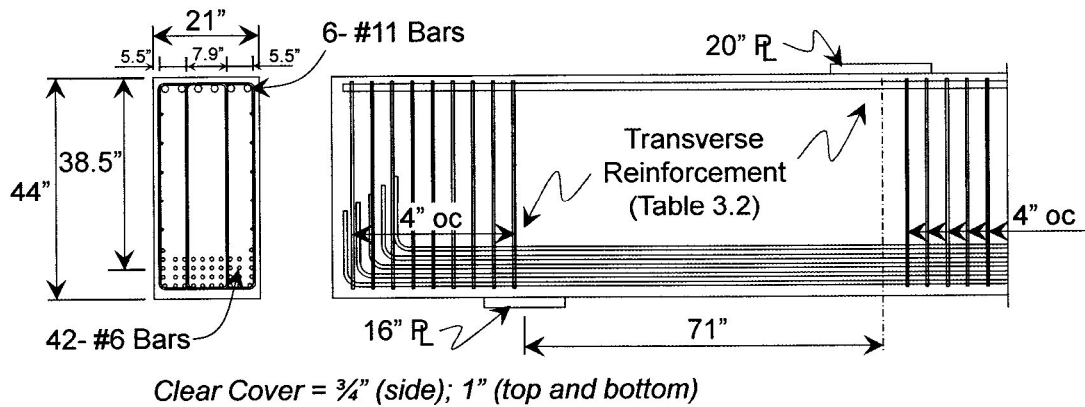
Detailing deep beams of series I (Birrcher 2006)
